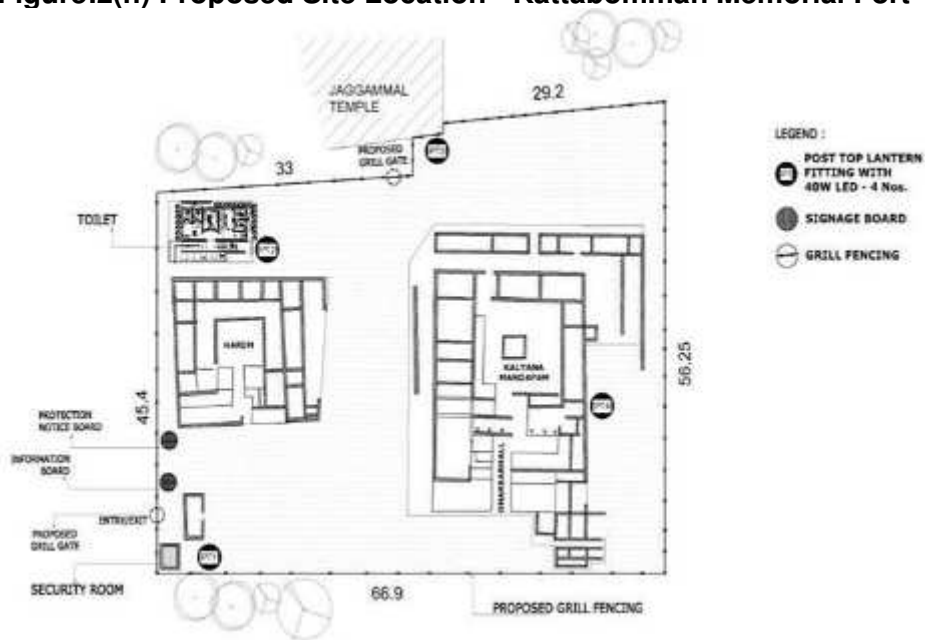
(h) Proposed site plan for subproject components – Kattabomman Memorial Fort
